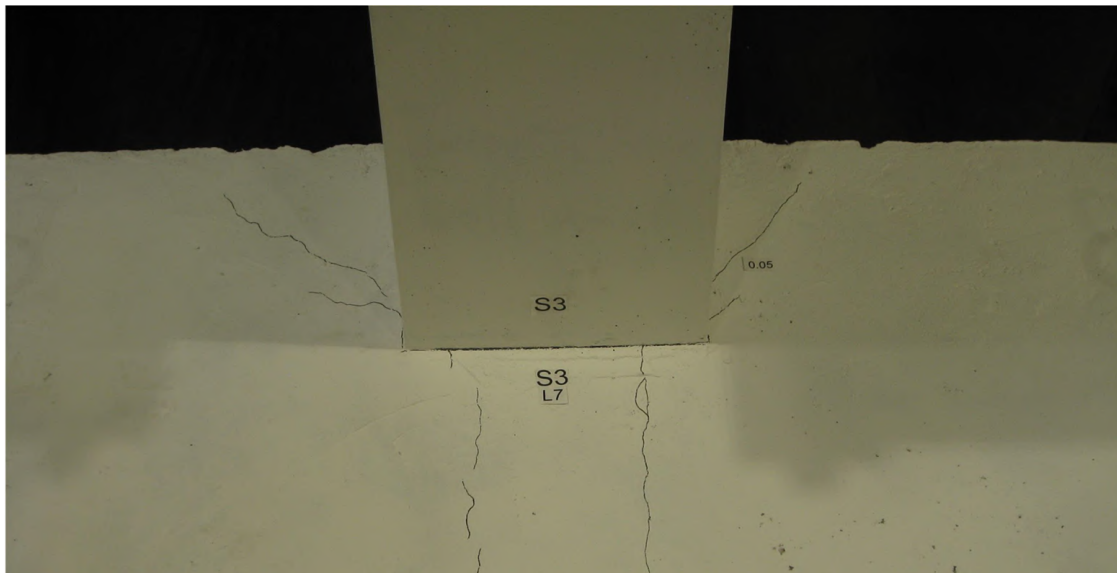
Specimen 3 slab cracks at $V = 84.9$ kN
